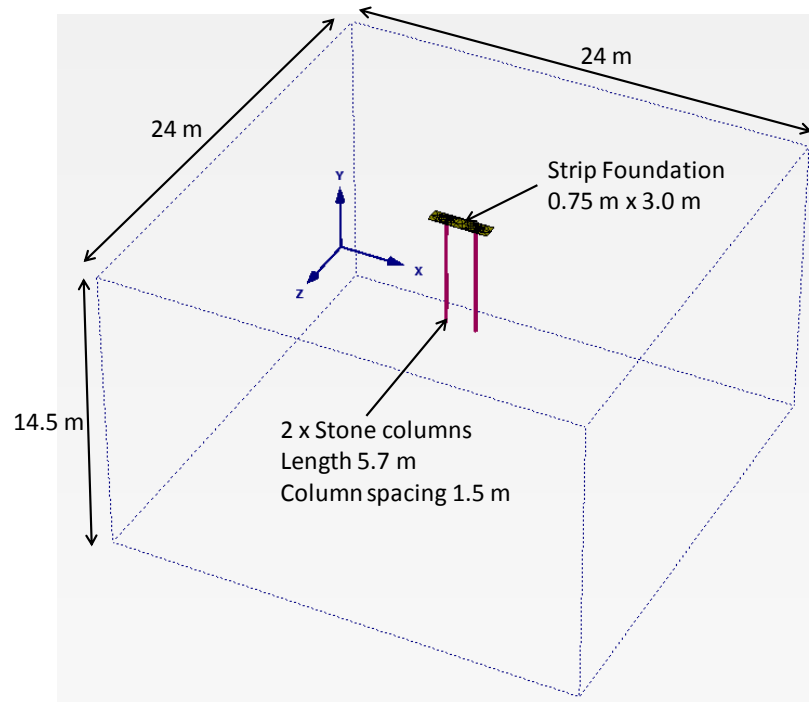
Geometry of the Strip foundation, columns and boundaries in Plaxis 3D for Watts and Serridge (2000)
